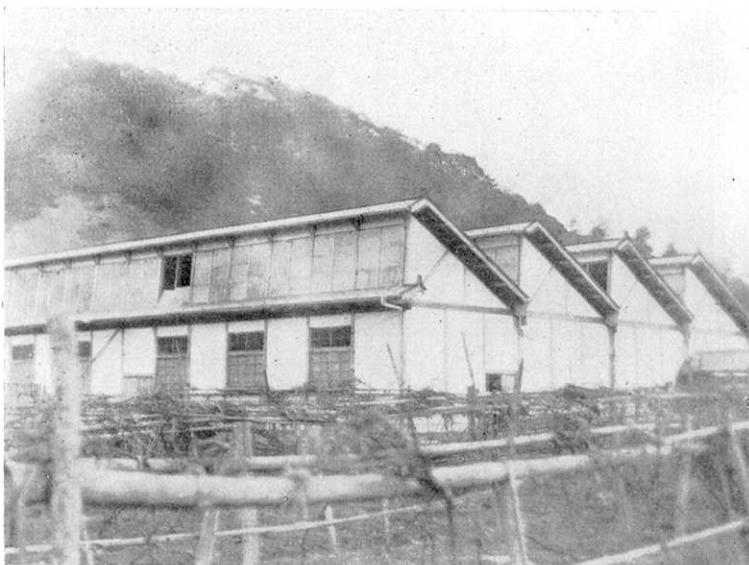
An example of good construction, roofed with light asbestos-slates and having braces between beams and struts.
